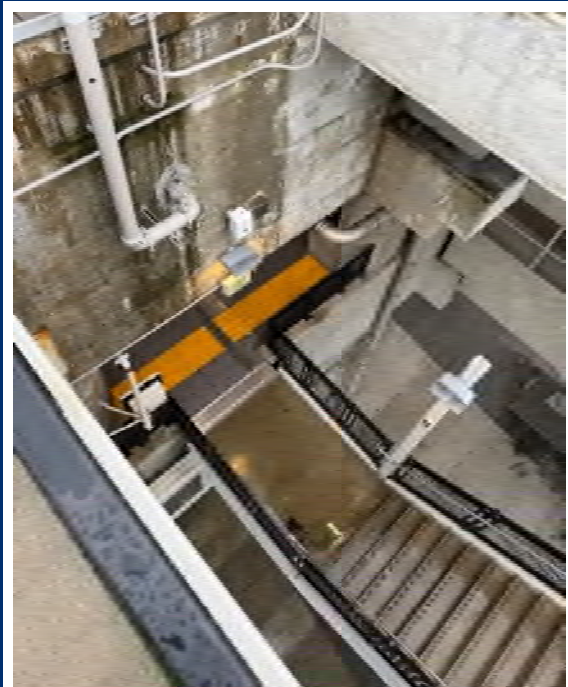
Northgate Station Stair from Mezzanine to Platform
